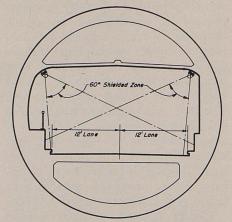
Typical cross-section of tube showing fixture orientation and illustrating shielding and light control.
